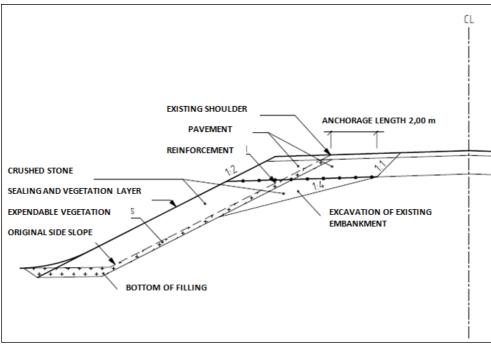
Schematic drawing of a paved road widening with reinforcement [Modified from Norwegian Public Road Administration 2007]
